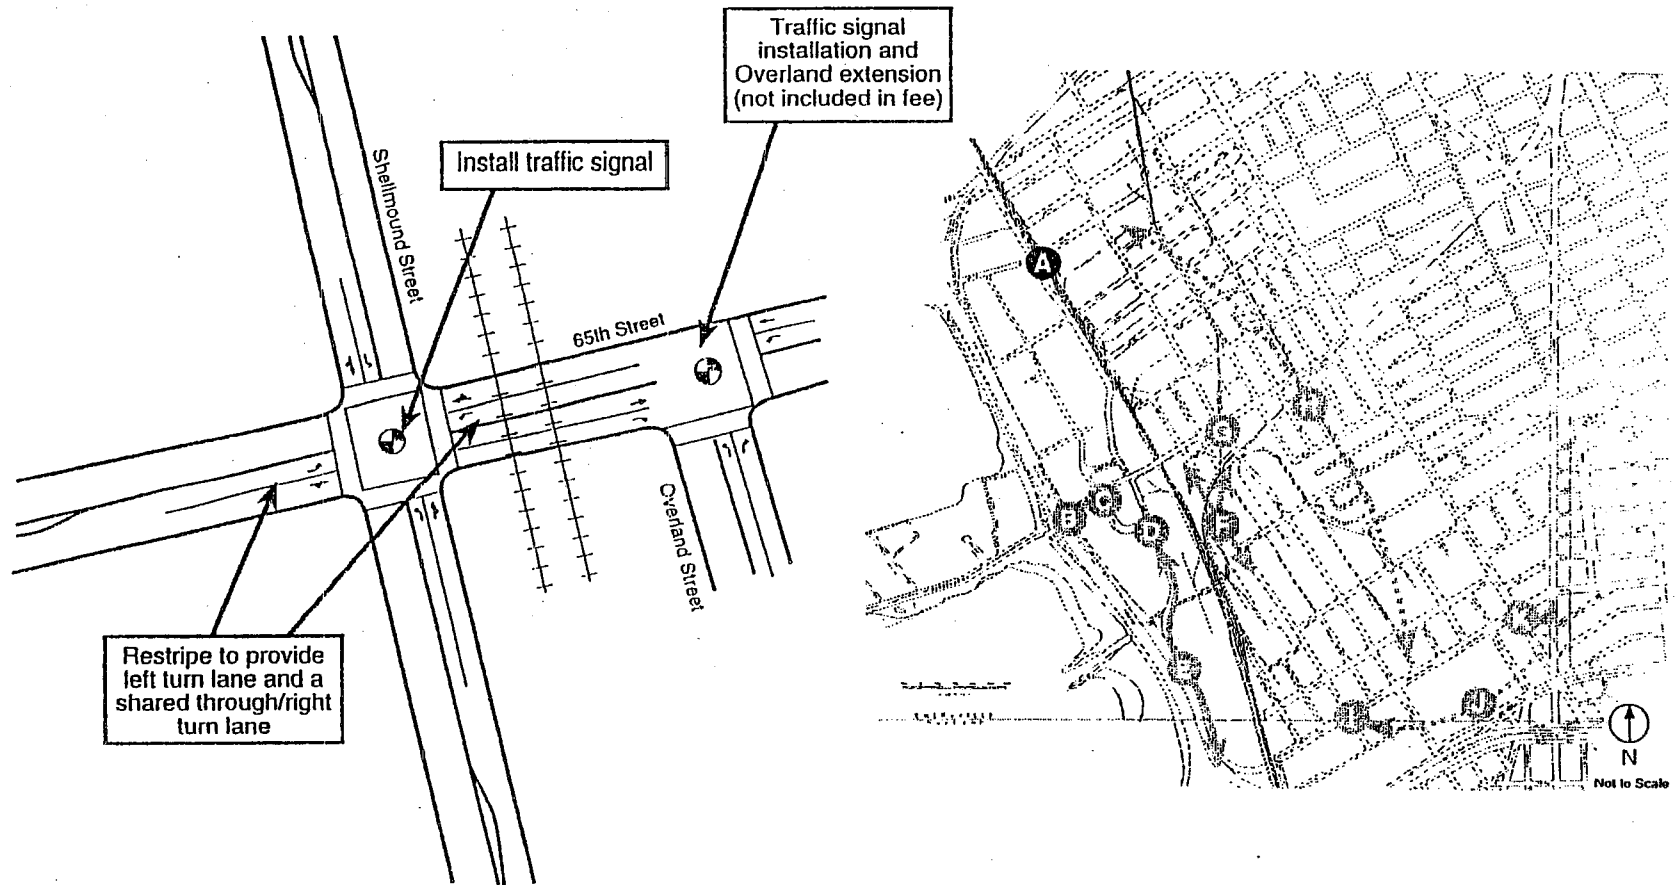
65TH STREET AND SHELLMOUND STREET INTERSECTION MODIFICATIONS
